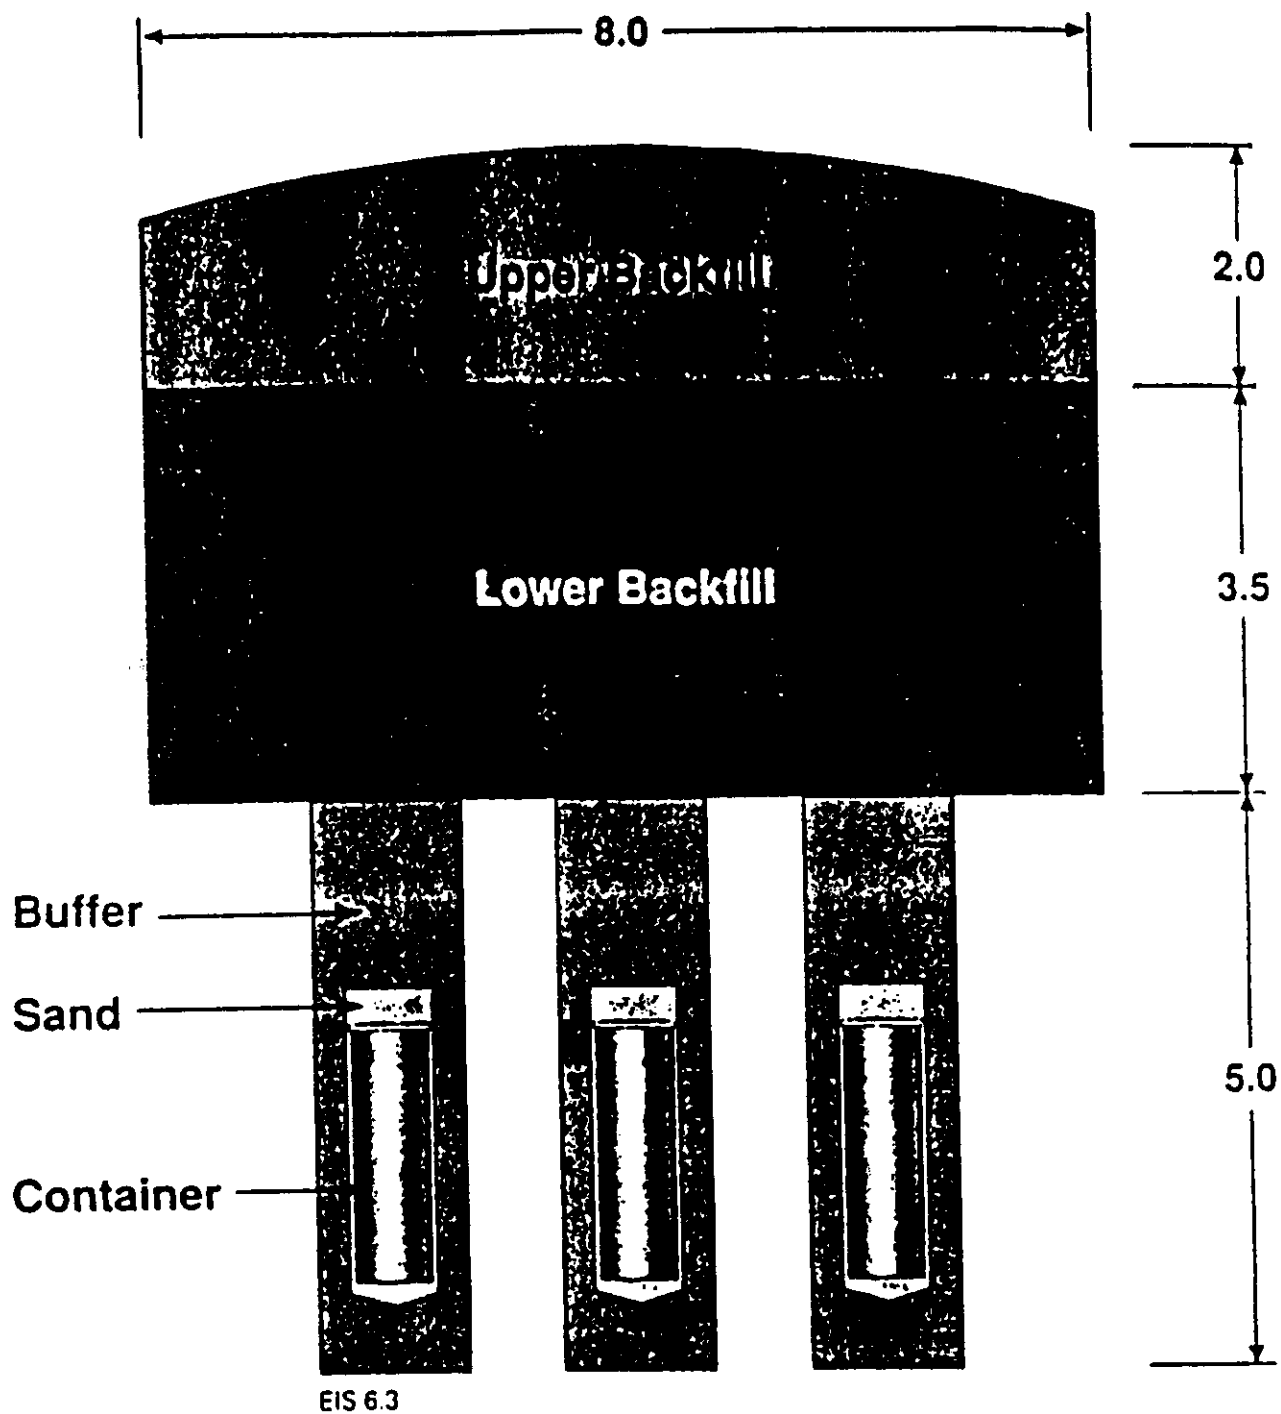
CROSS SECTION OF A FILLED DISPOSAL ROOM IN THE PRE-DISPOSAL-FACILITY
